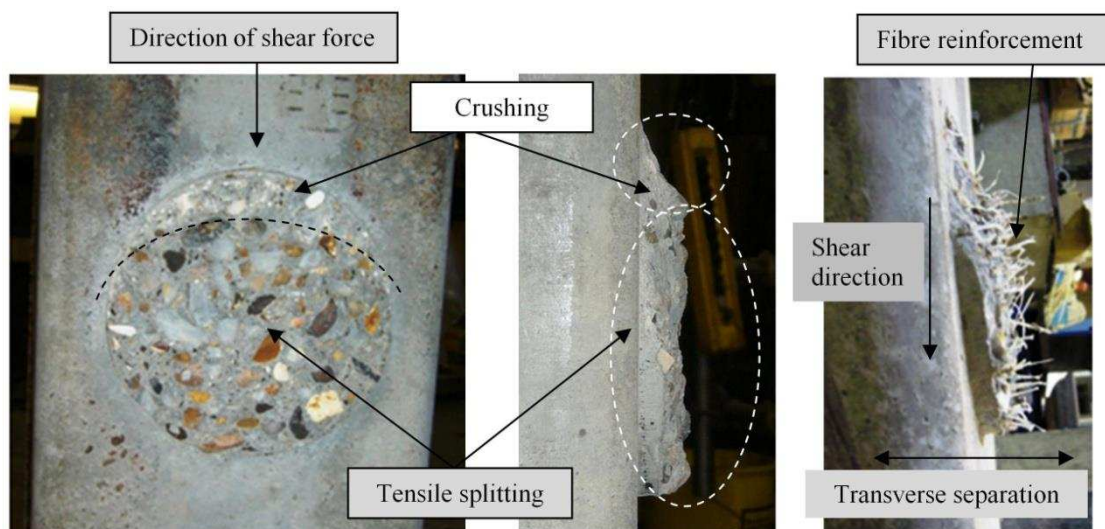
Failure profiles of the concrete-infill-only shear connection
